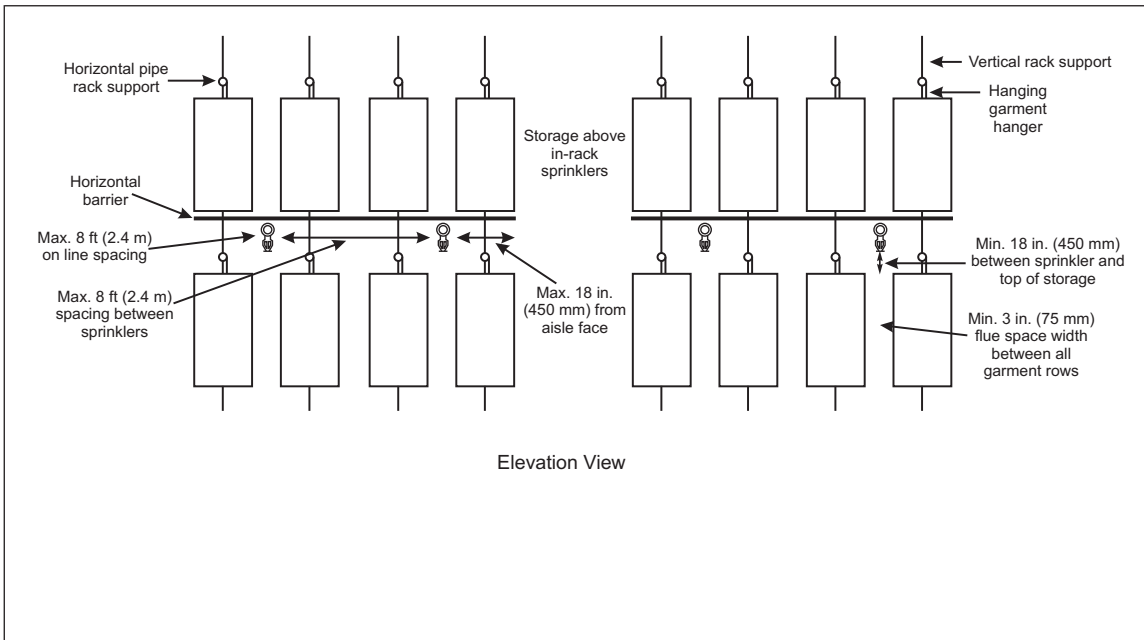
Horizontal location of in-rack sprinklers for storage over 2 hanging garment rows wide with horizontal barriers
